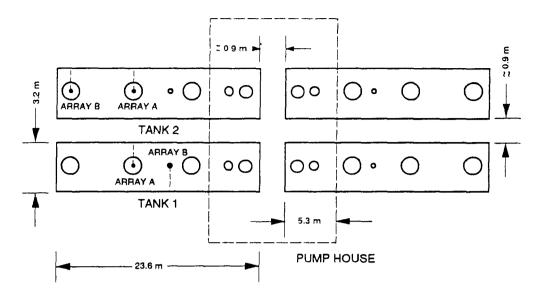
Plan view of the underground storage tank cluster at Griffiss Air Force Base.
